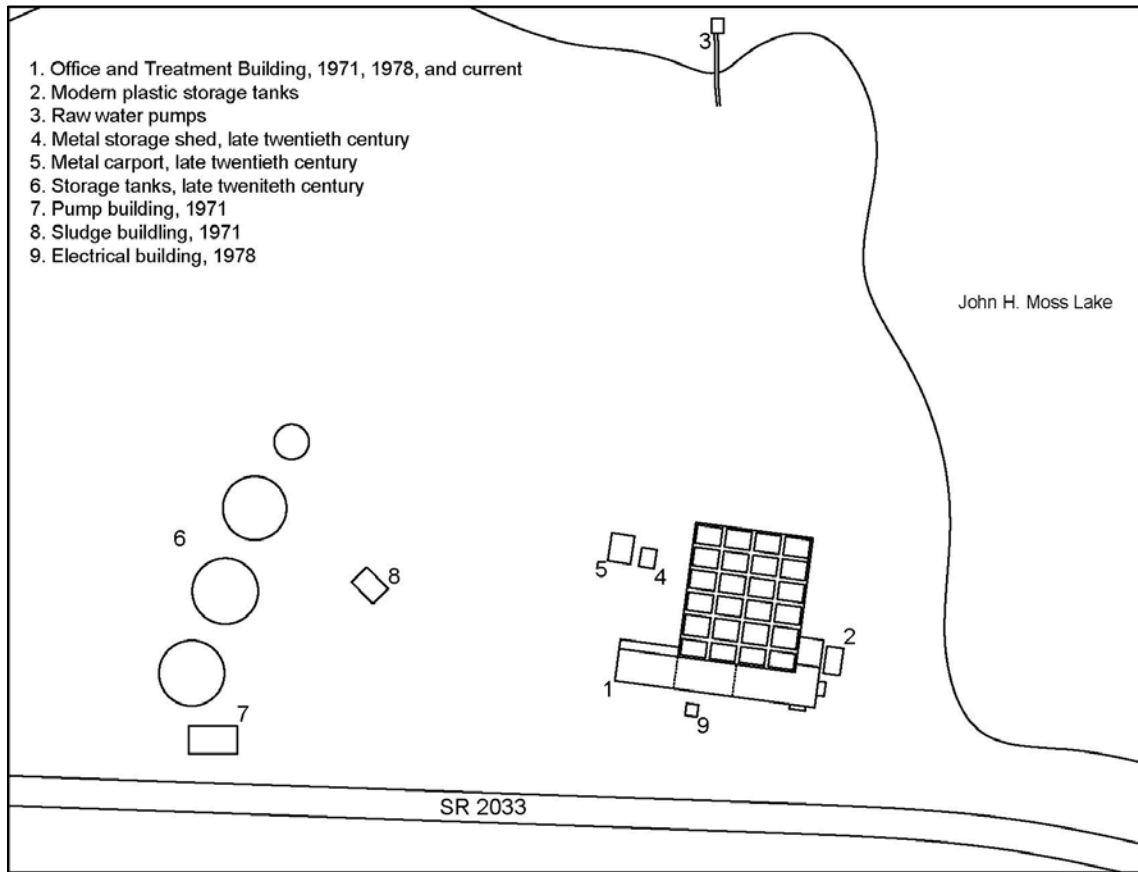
Site plan of the T. J. Ellison Water Treatment Facility, not to scale.
